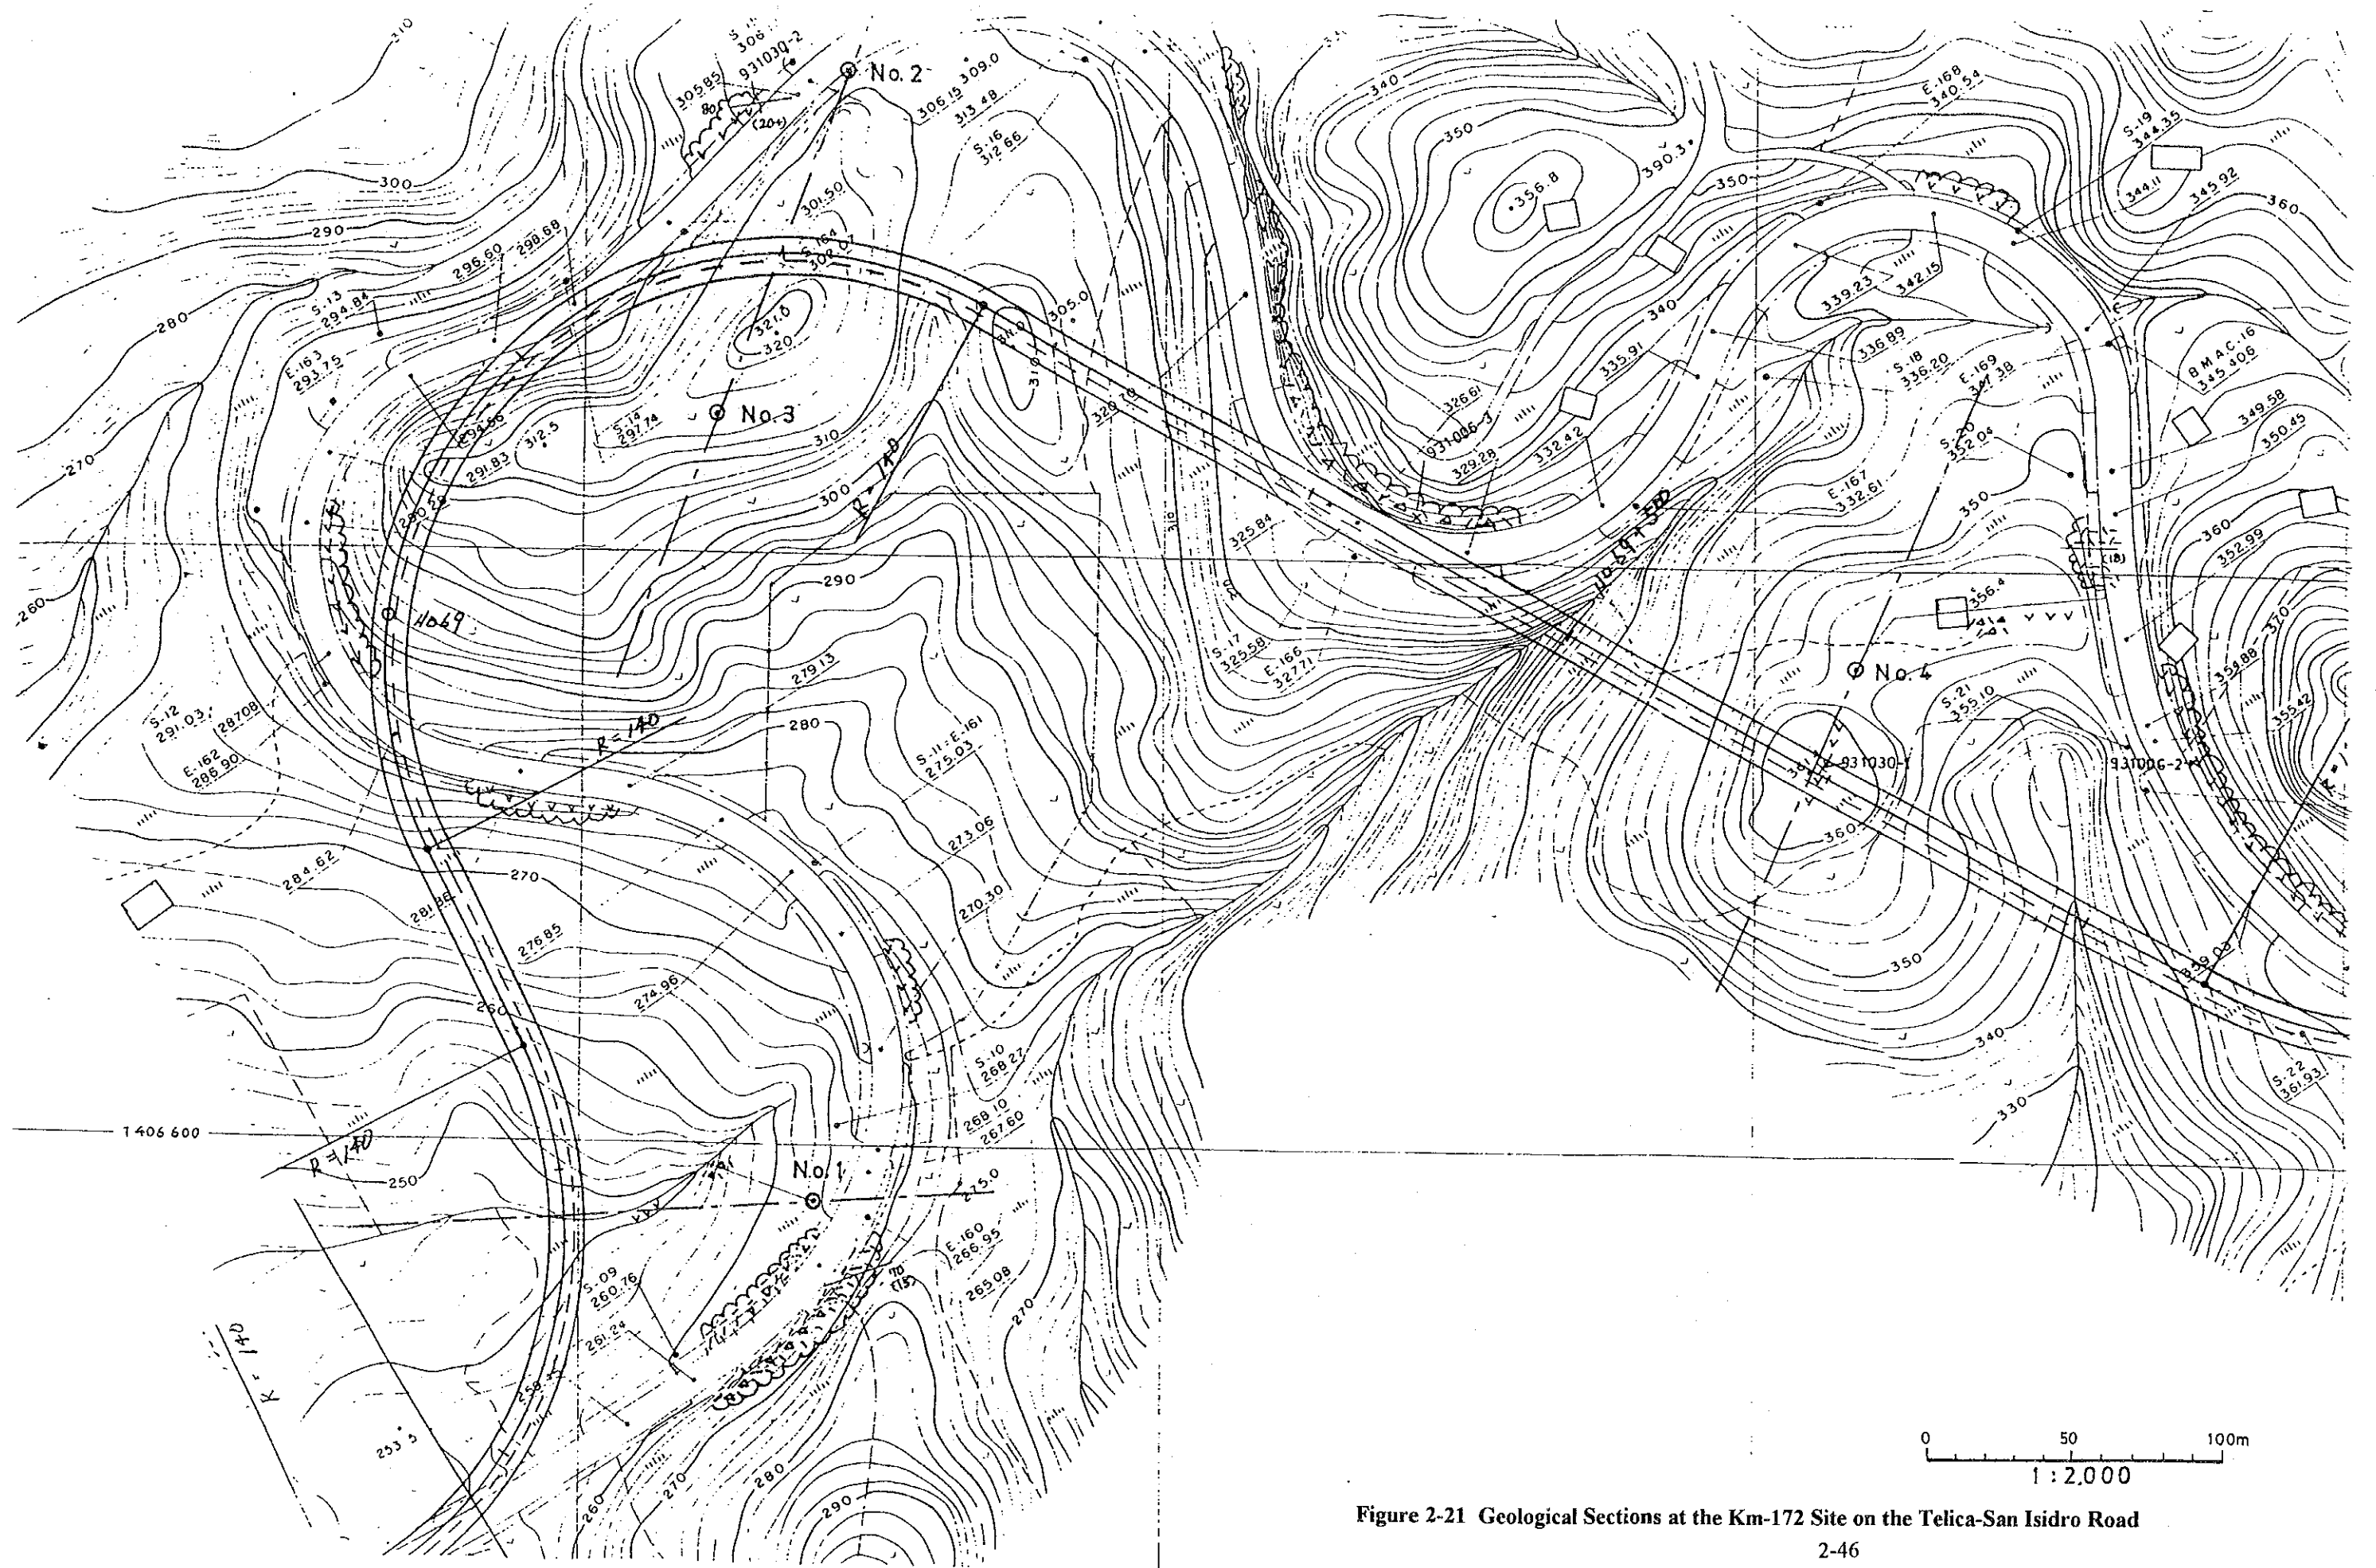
Geological Sections at the Km-172 Site on the Telica-San Isidro Road
